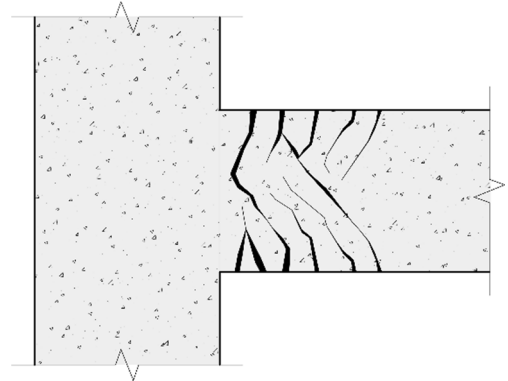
Elevation view of a typical crack pattern expected in a beam-column joint plastic hinge subjected to reversed cyclic loads.
